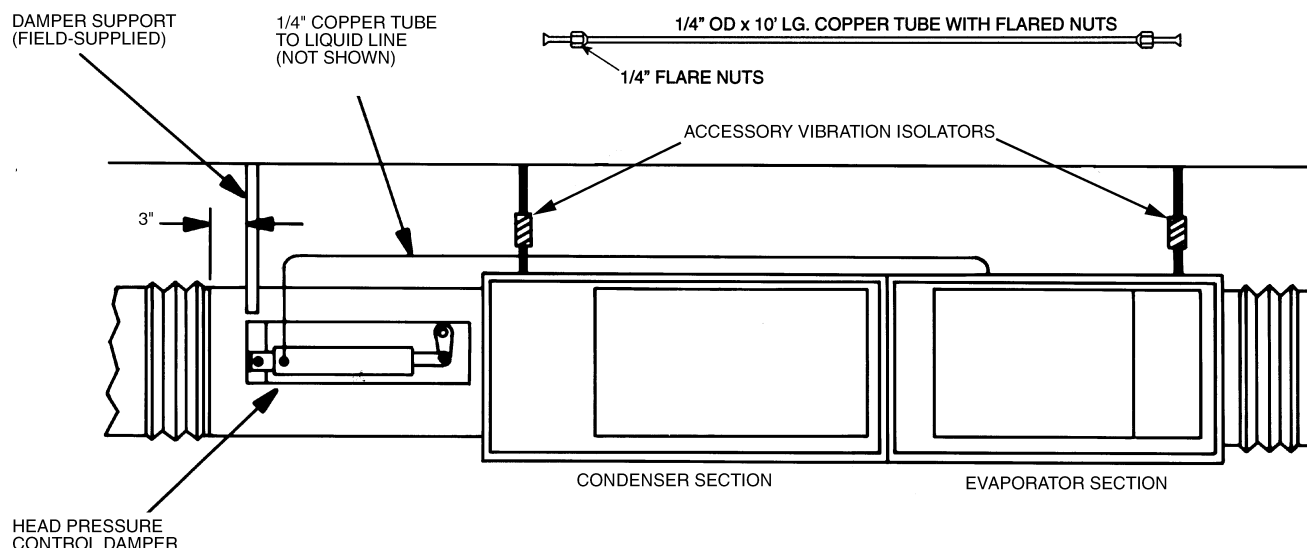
Head Pressure Control Damper Installation — Factory Configuration
